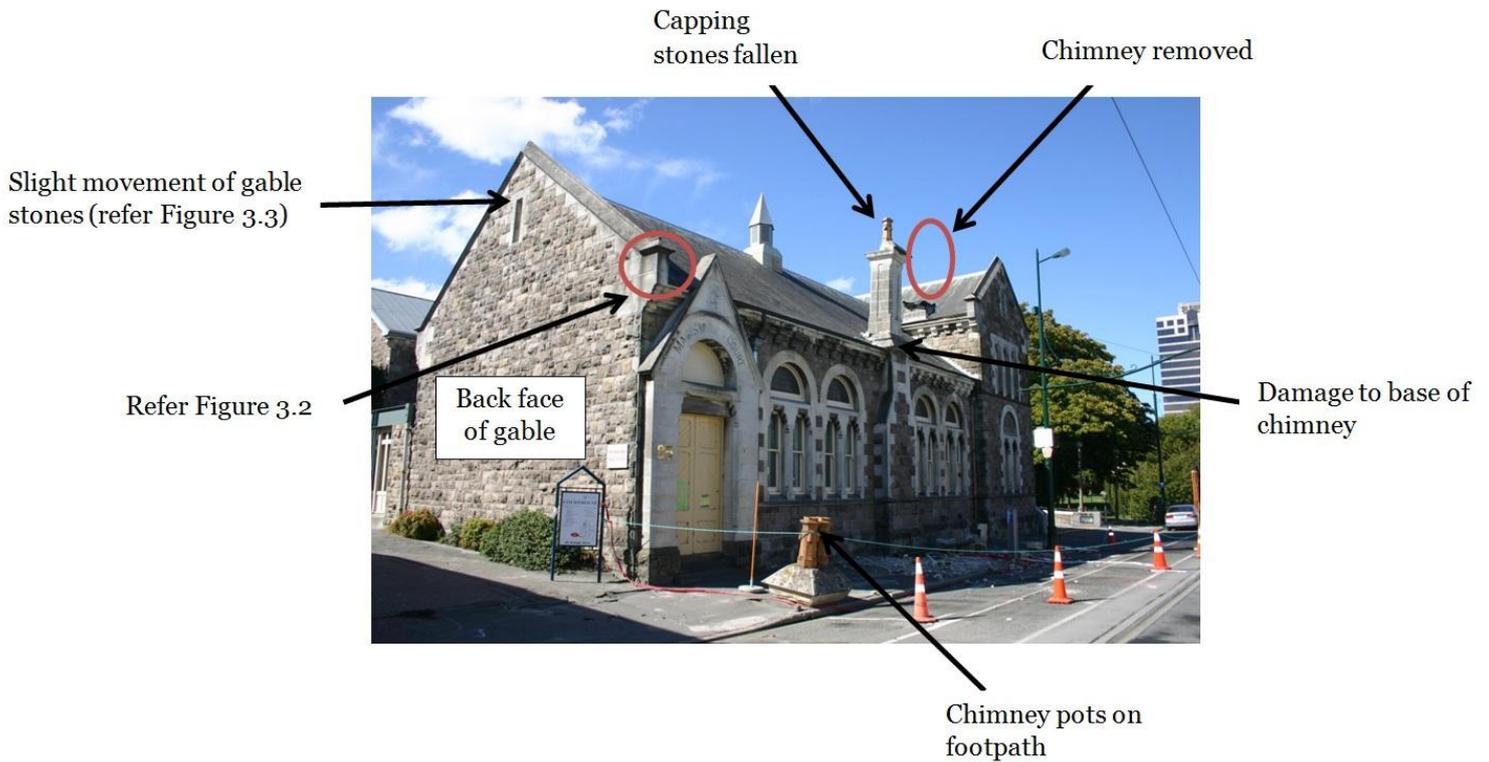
West and South elevation taken after February 22nd 2011 earthquake
